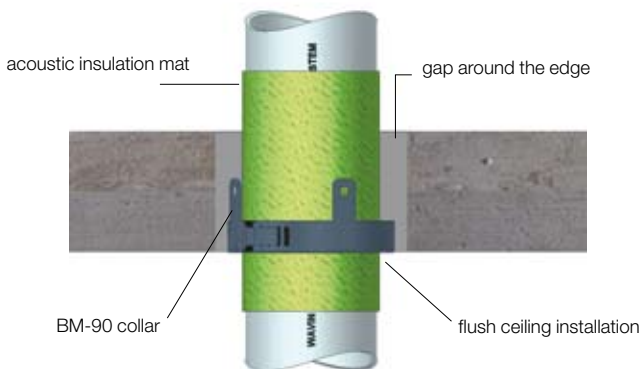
BM-90 fire collar: seal for straight ceiling installation
